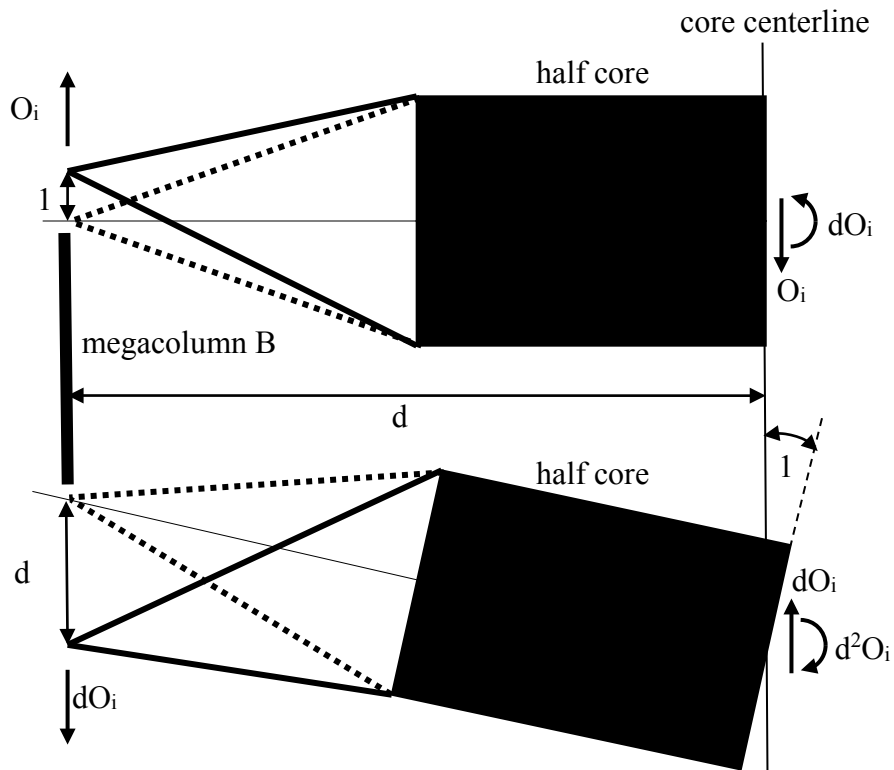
Stiffness of Two-Member Outrigger Truss
